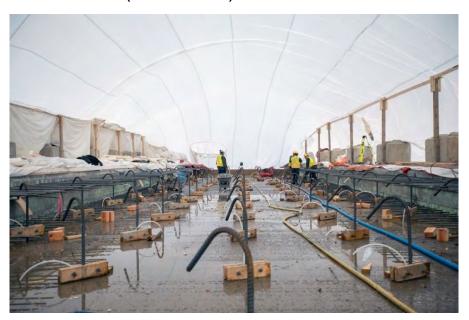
Construction of the intake gate of penstock Unit 3 (November 2019)
